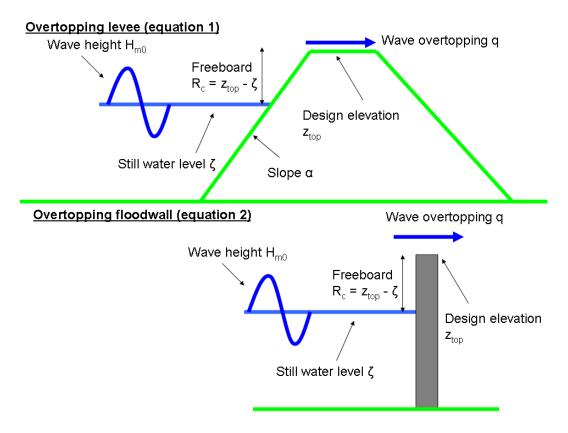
Definitions for Overtopping for Levee and Floodwall
